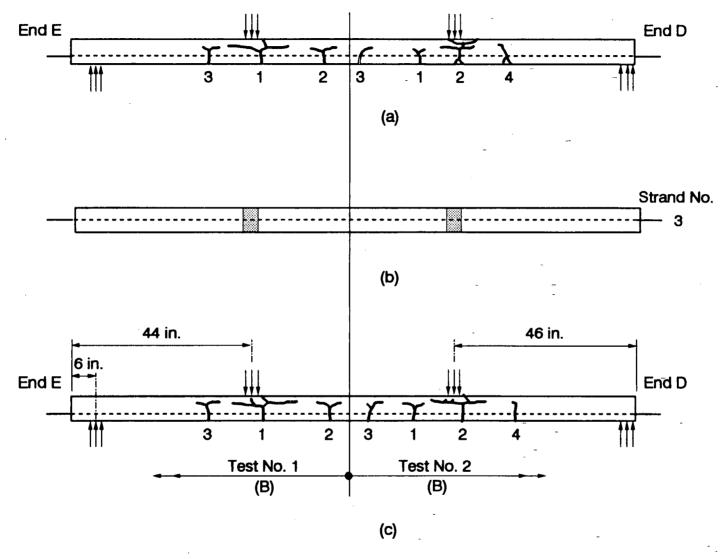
Crack patterns for D-type Specimen No. 10-6.0DU-11: (a) mirrored side view along Strand No. 3; (b) top view; (c) side view along Strand No. 3
